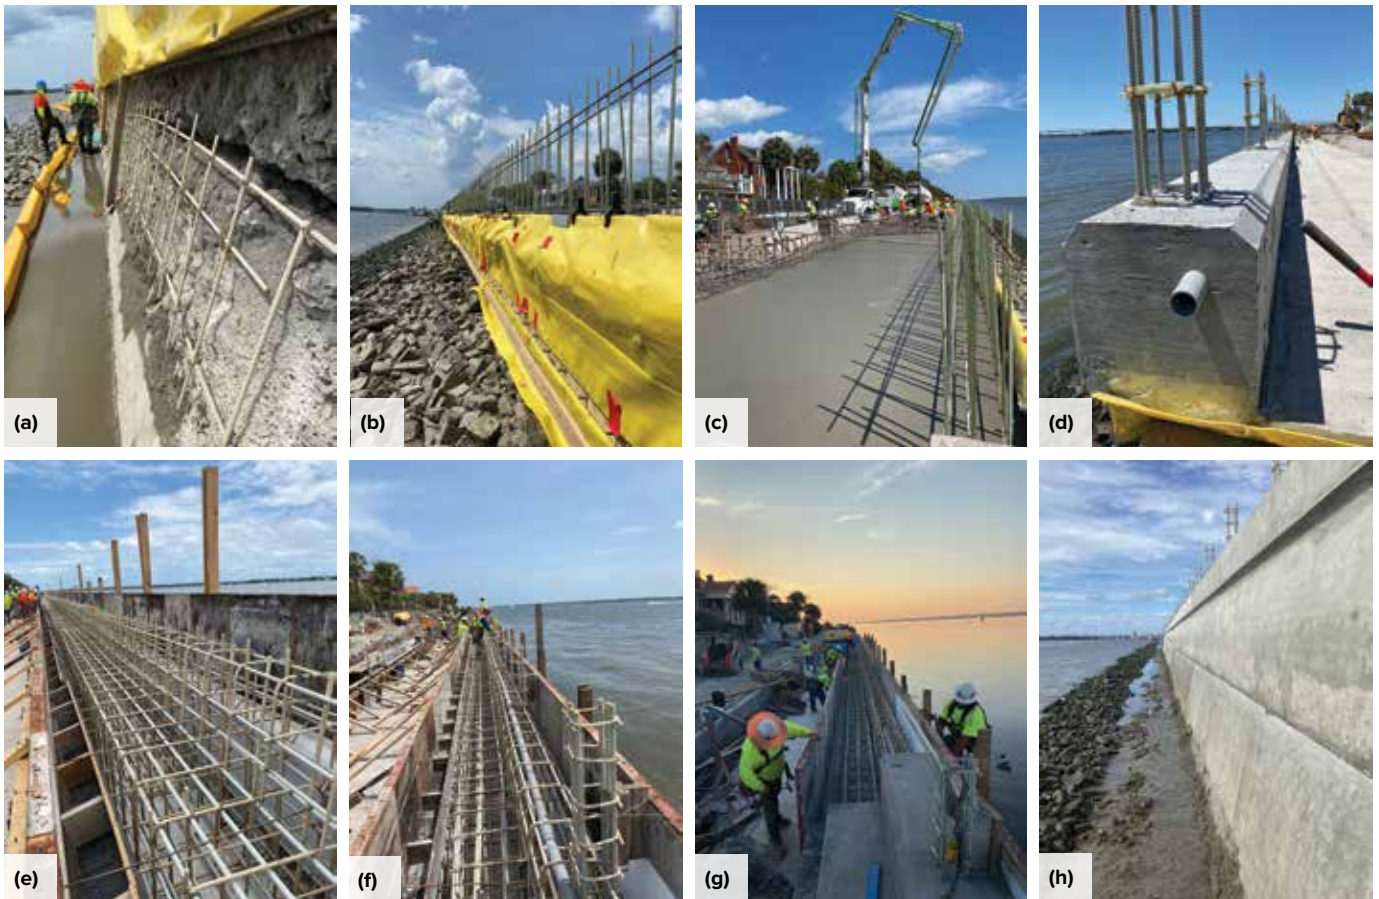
The battery wall during the main phases of construction: (a) hydrodemolition and repair; (b) protective visqueen barrier; (c) concrete seaside promenade placement; (d) seawall cast-cap; (e) and (f) GFRP grade-type beam; (g) GFRP with and without placed concrete; and (h) finished seawall face at low-tide conditions
